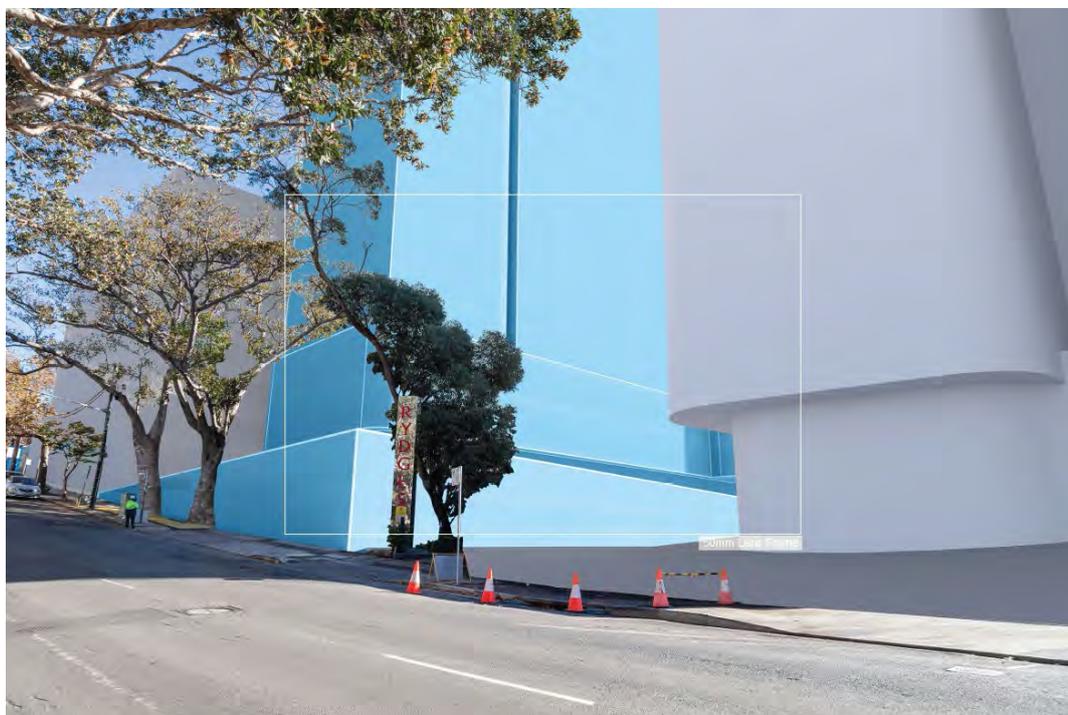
Viewpoint 1 – North west view from McLaren Street: proposed view
